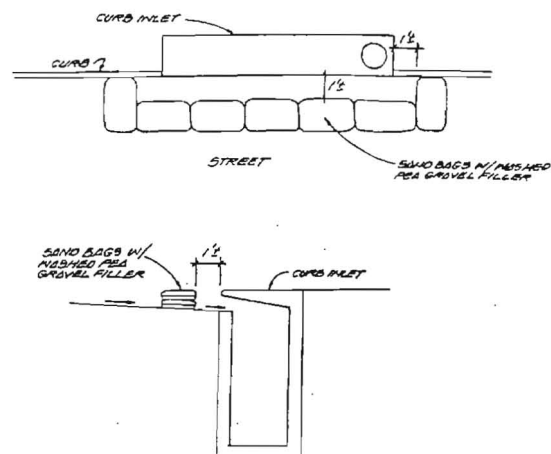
Diagram of Bagged Gravel Curb Inlet Protection (Pape-Dawson).
